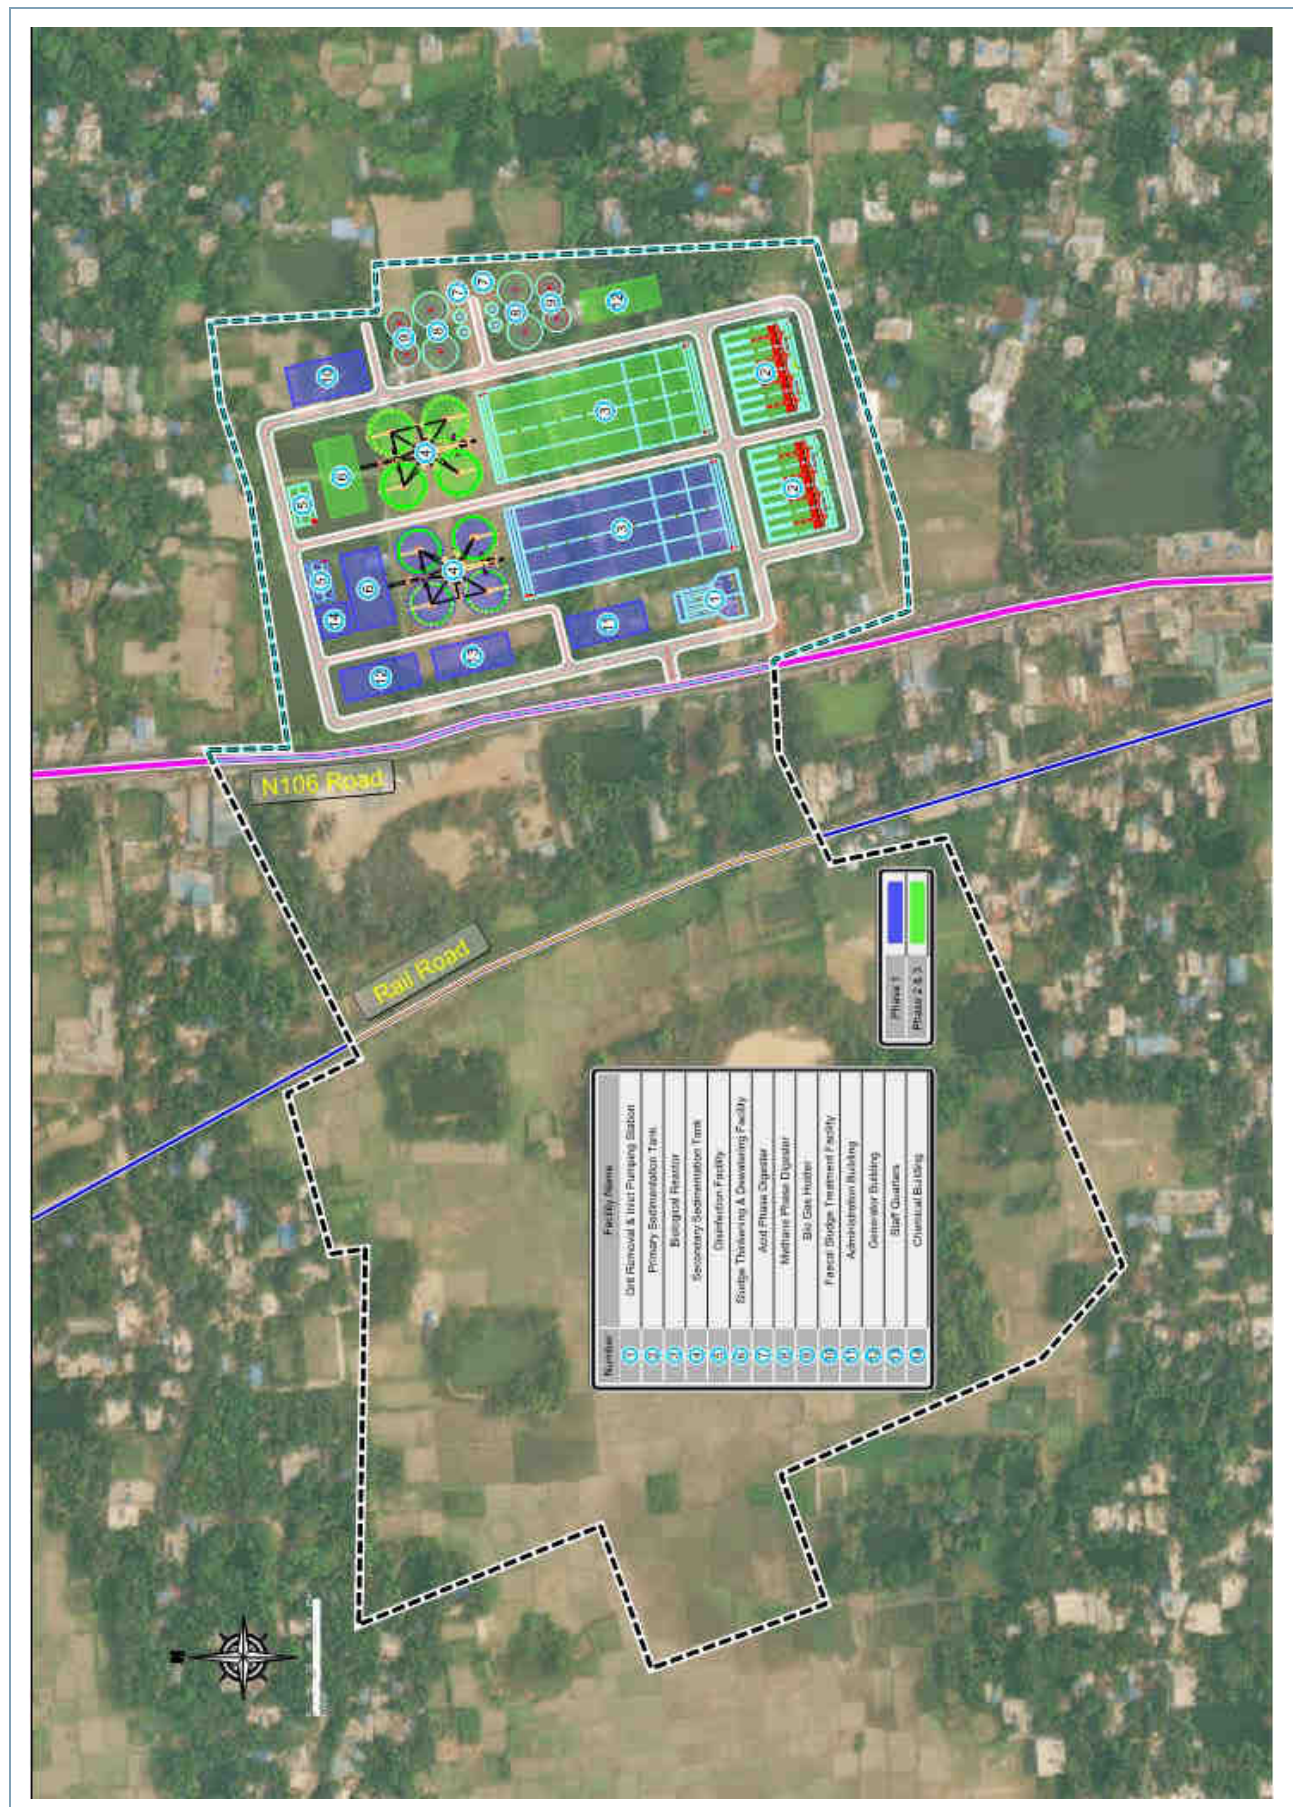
Layout of Sewage Treatment Plant (Option-1)
